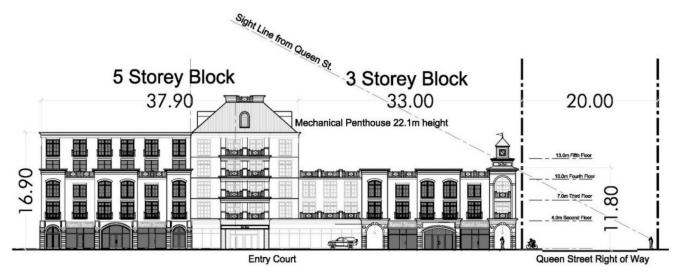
South Elevation Showing Parking Court and Sight Line from Queen St. Toward the 5 Storey Component
